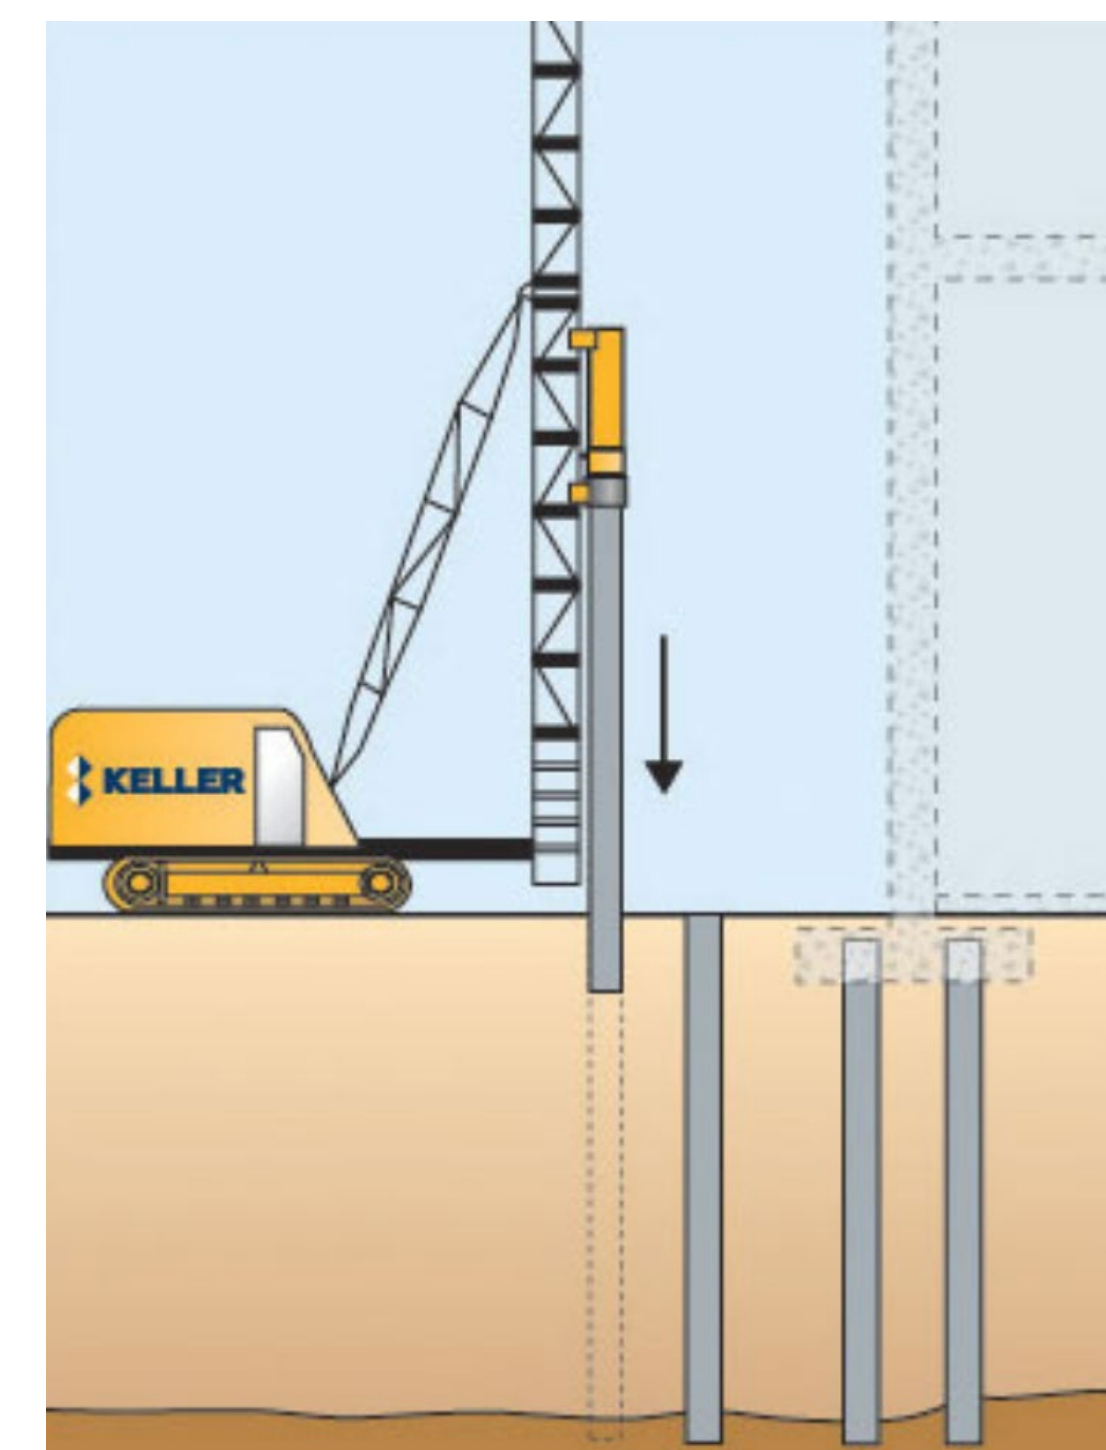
Driven Piles – generally steel H - sections, or pipes pounded into the soil.
